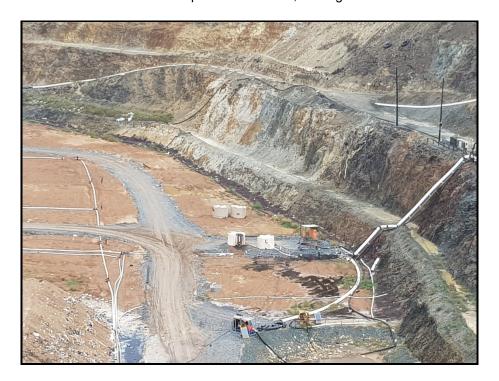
North western boundary of the bioreactor, looking towards the south west. Pipework running to the leachate dam.
